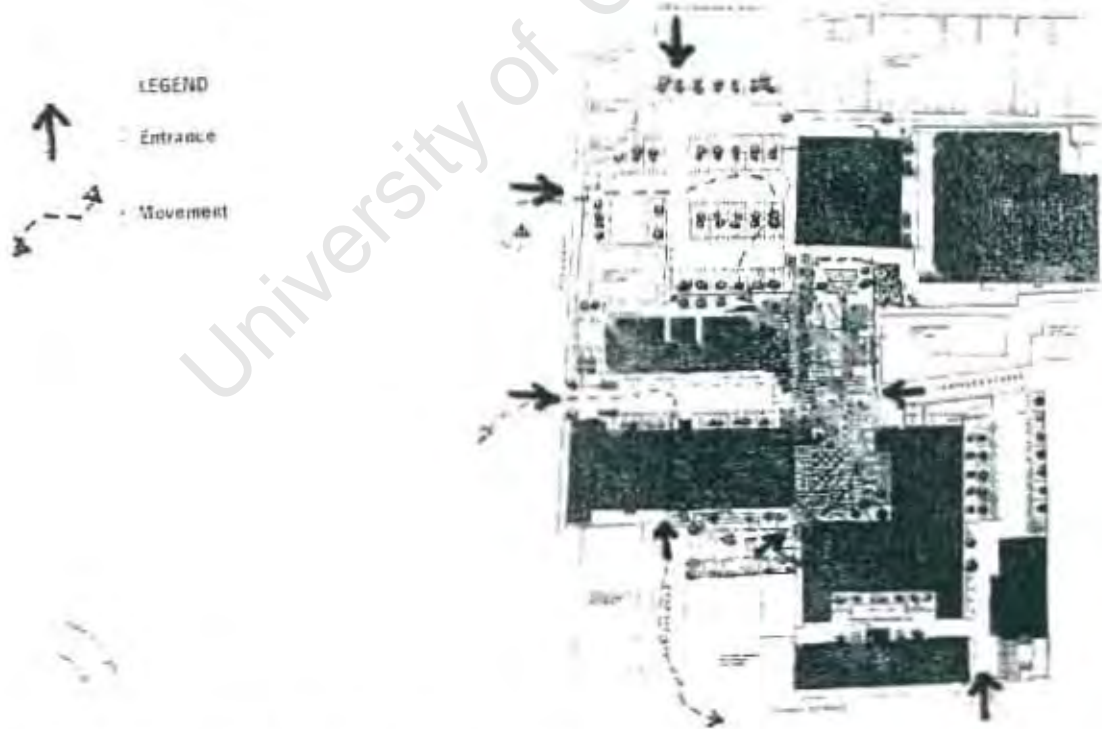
/29: Plan indicating where site was opened up after the conversion and showing entrances (based on map provided by Piet de Beer)
